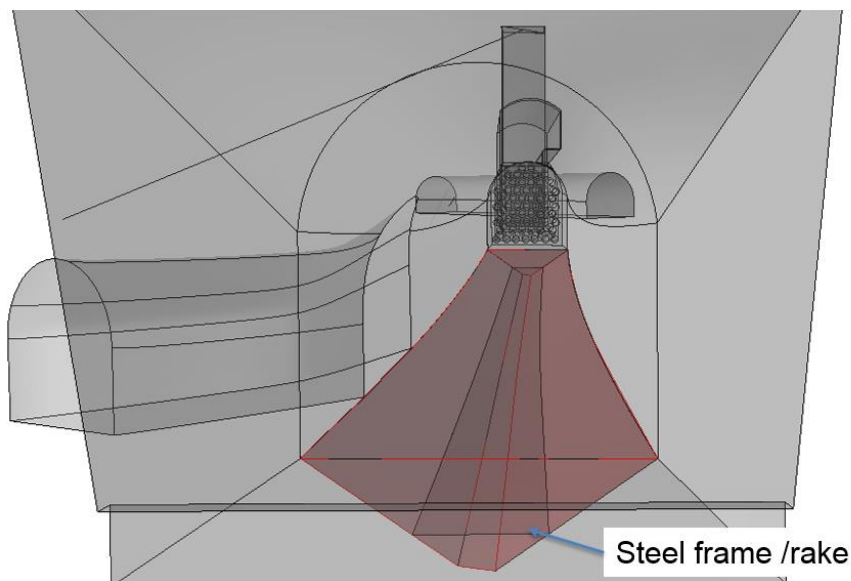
Variant 5 with flow calming pipes and bottom trench for sluicing facility, view from front
